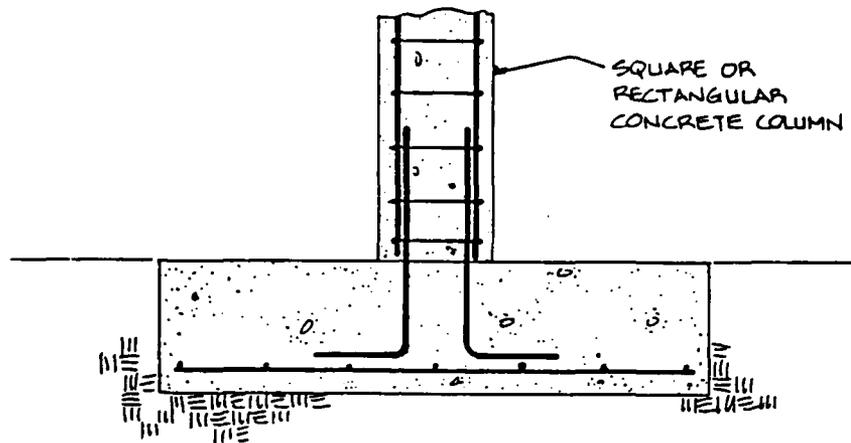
Reinforced Concrete Cast-in-Place Column Base Connections.
